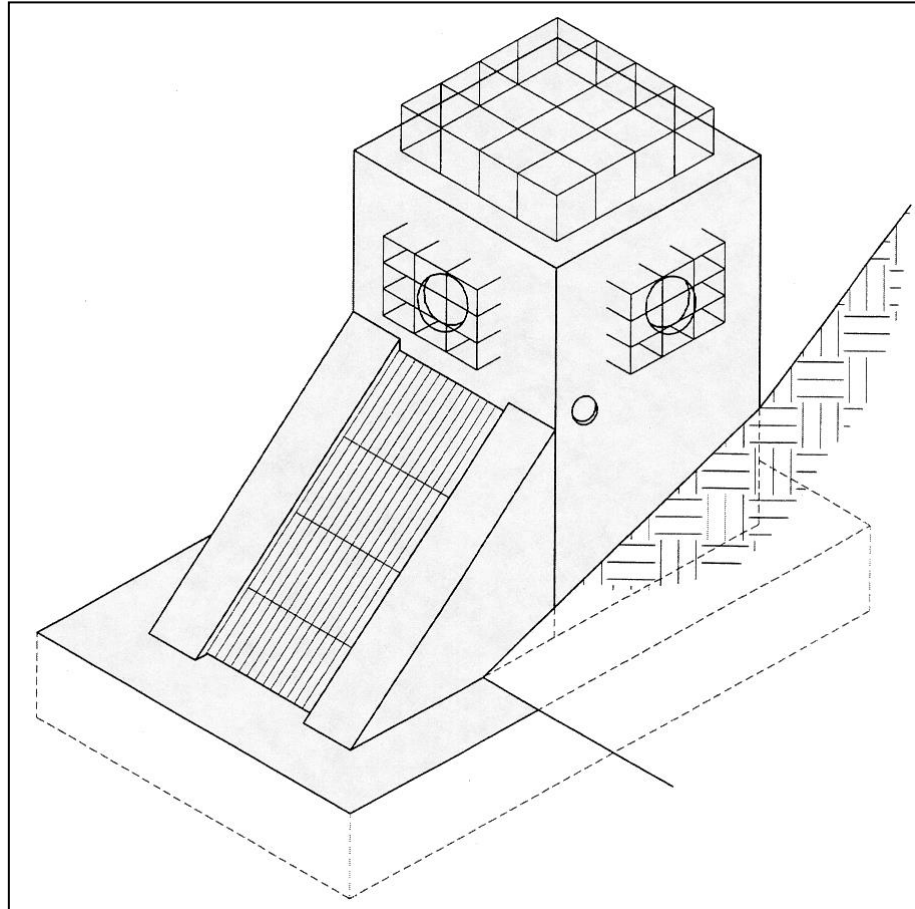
Example of Various Trash Racks Used on a Riser Outlet Structure
